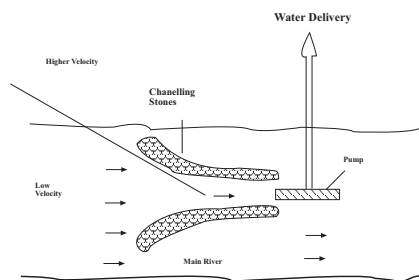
CHECK STRUCTURE FOR PUMP INSTALLATION
